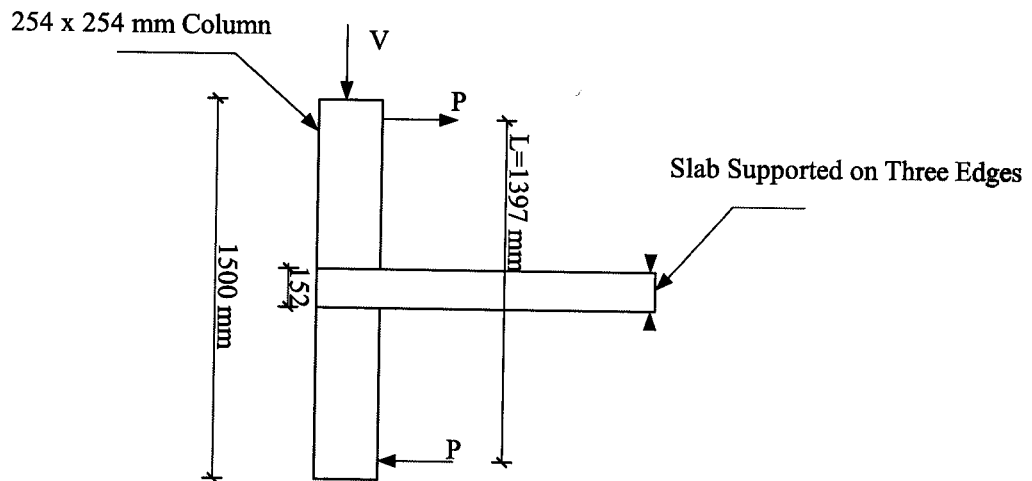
Loading Arrangement of (Megally and Ghali (2000)) Test Specimen
